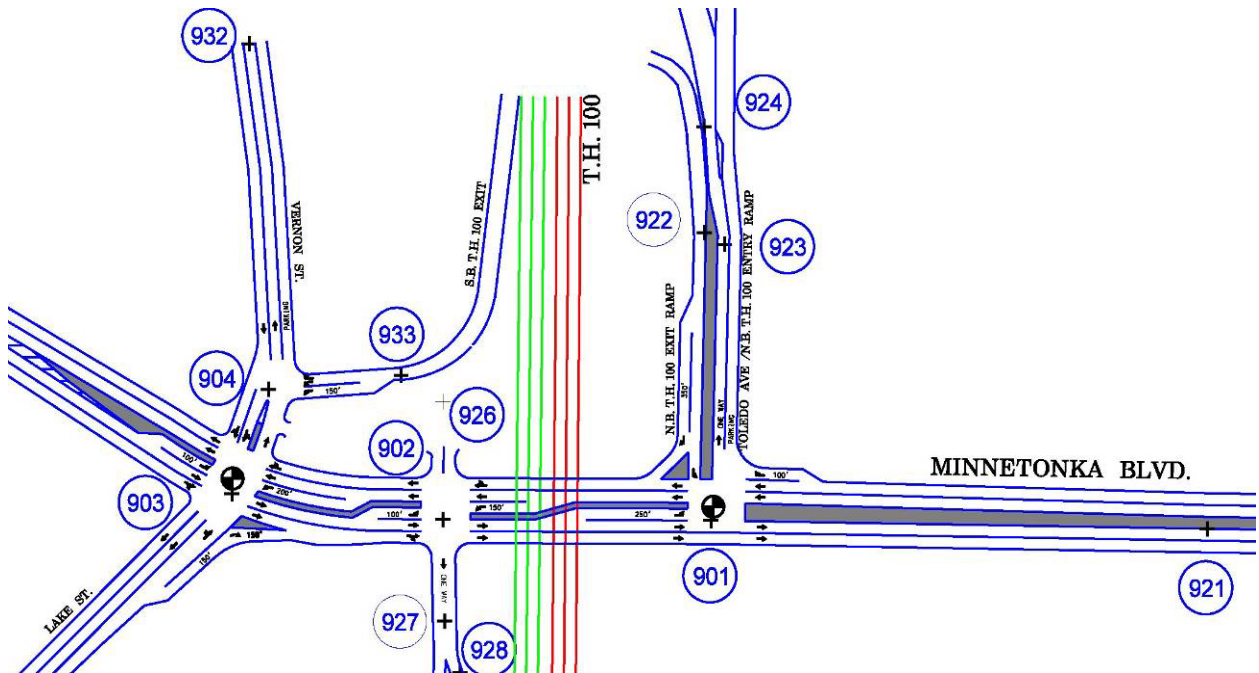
Drawing. Example problem: Minnetonka Blvd. lane geometry drawing.
